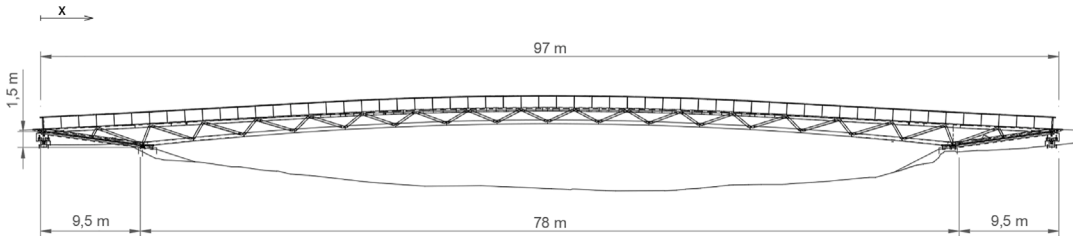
Elevation view of the Folke Bernadotte Bridge.
